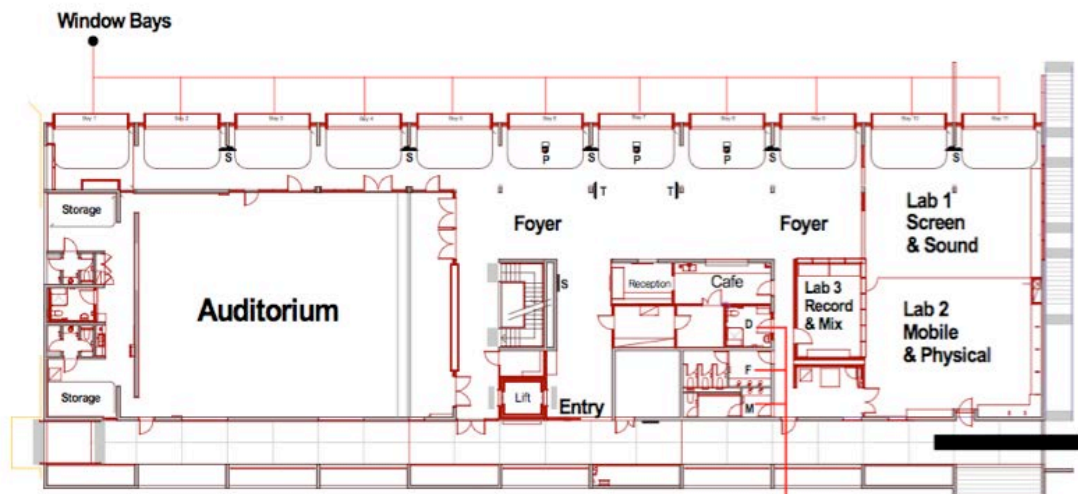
Floorplan of The Edge: Multiple work lounges (window bays) and labs provide space for collaborative work activities and meetings.
